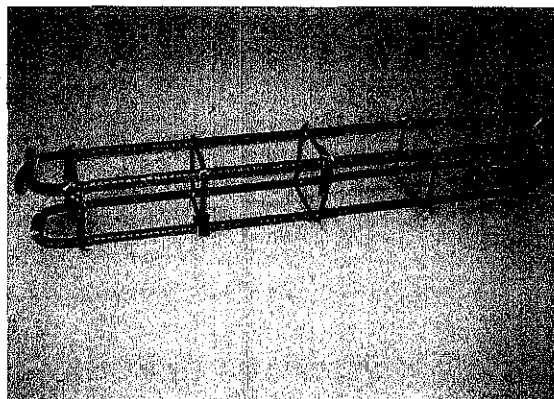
Reinforcement Bar of RC beams using T12 and R6 bar
